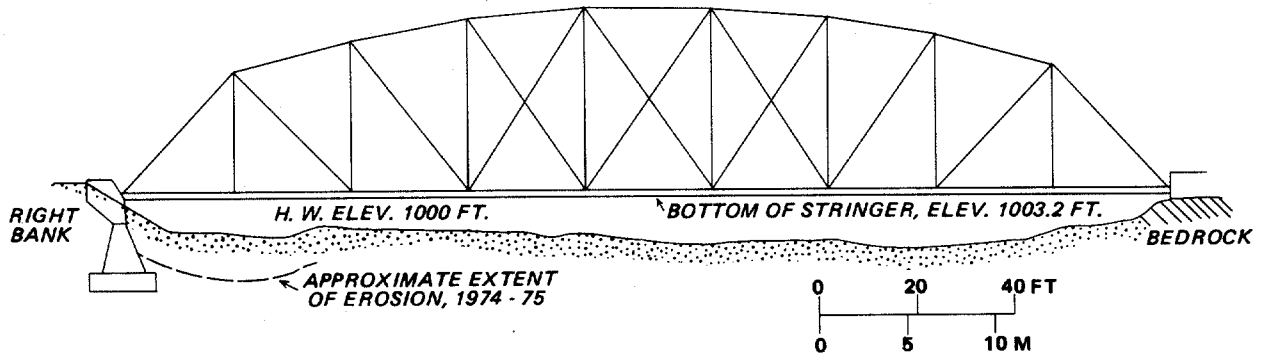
Elevation of Forest Service bridge 394.2.4, from original plans; on December 22, 1976, channel bed near center of crossing was at elevation 1,000 feet.
